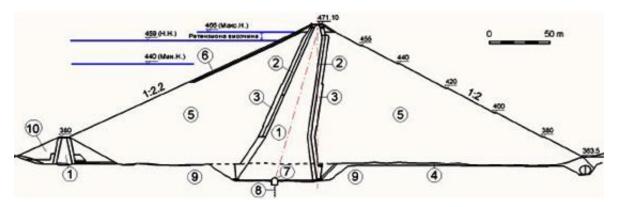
Main cross-section of Kozjak Dam, section no. 17. (1) Clay core; (2) first transition zone; (3) second transition zone; (4) river deposit; (5) rock-fill shells (limestone); (6) arranged slope protective stones; (7) grouting gallery; (8) grout curtain; (9) rock foundation (limestone); (10) gravel in the upstream cofferdam
